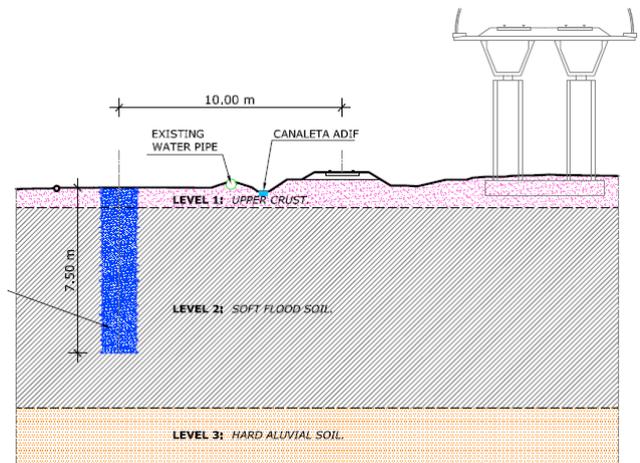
Cross-section – Soilcrete® as a vertical wave barrier
